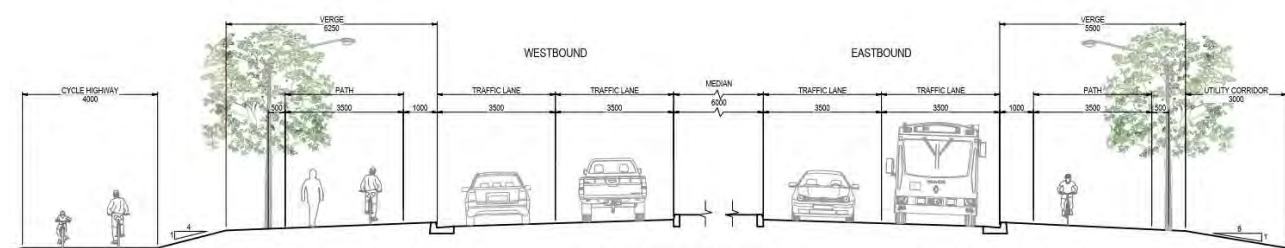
Typical cross section – Molonglo 3 East Connector Road to Tuggeranong Parkway
